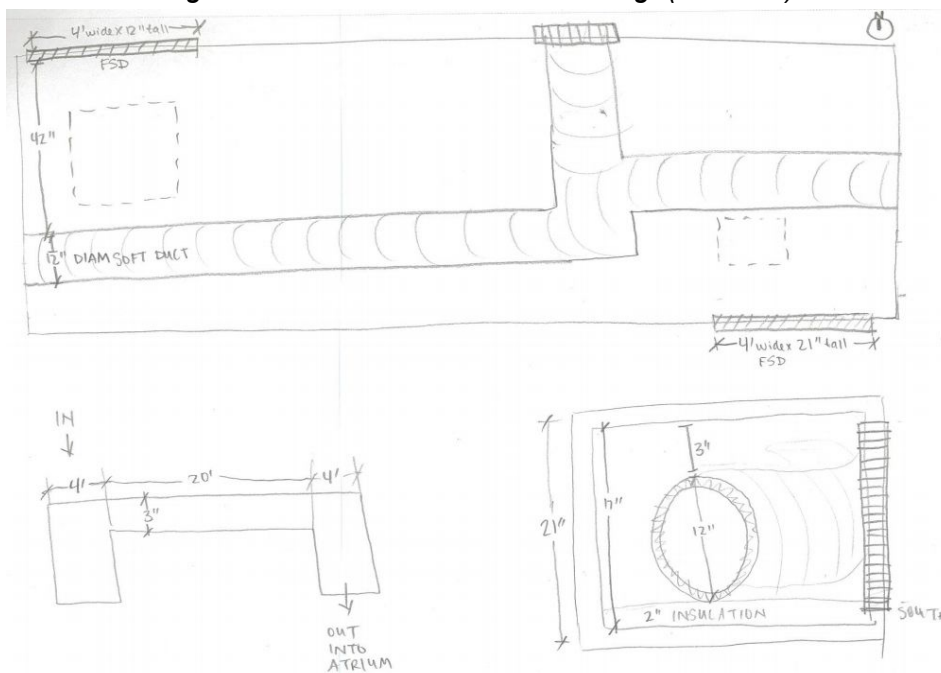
KMC 180 Plenum Drawing. (Eastern)
